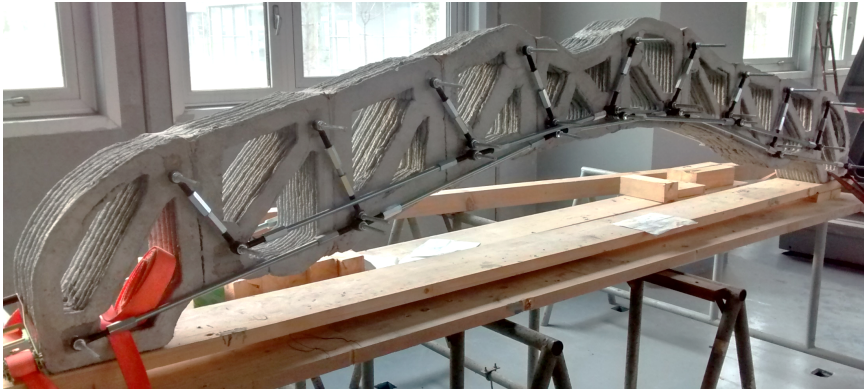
Typical assembly view of a 3D printed RC beam with a variable cross-section.
